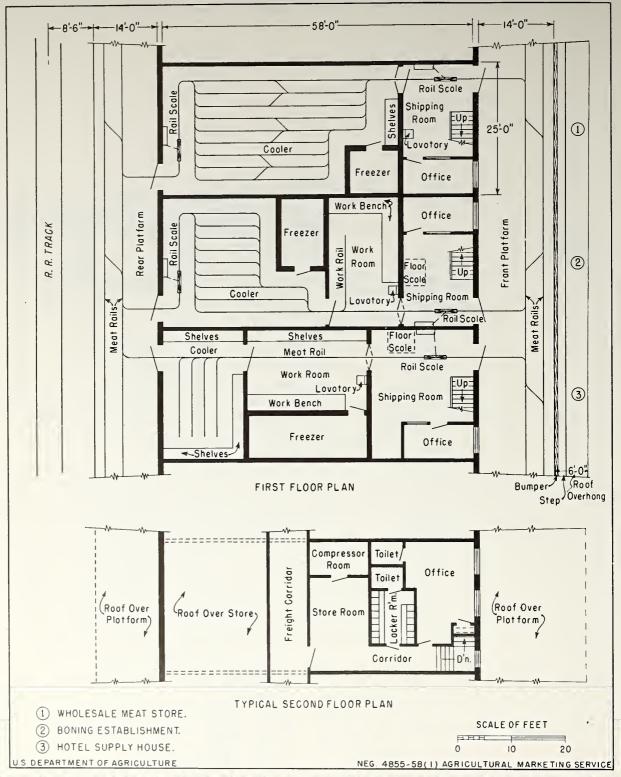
Suggested floor plans for (1) wholesale meat store, (2) boning establishment, and (3) hotel supply house.
